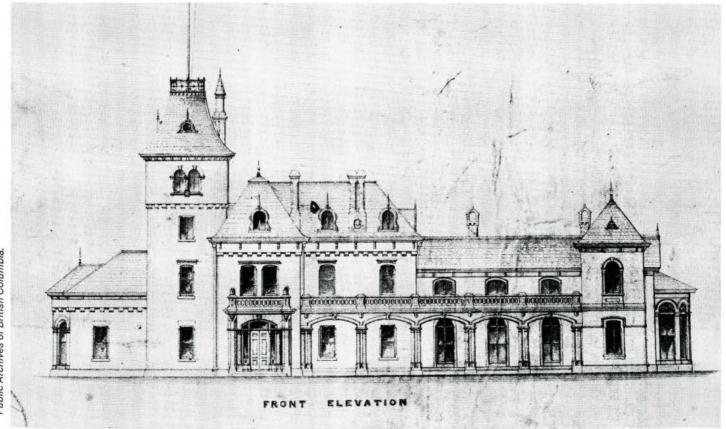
Additions and renovations to Carey Castle, front elevation, archts. Wright and Sanders; 1865.
